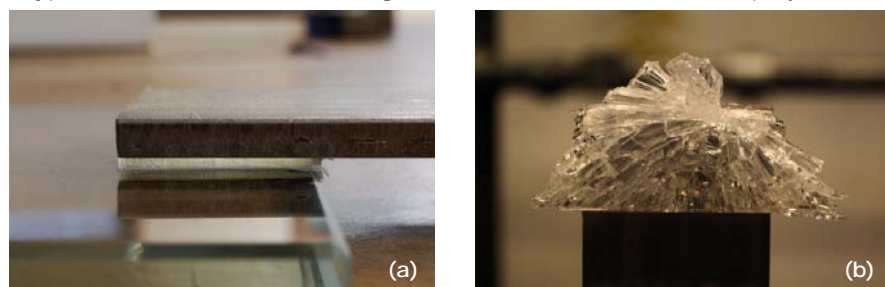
(a) steel-glass adhesive bond (b) glass failure on a SentryGlas specimen
